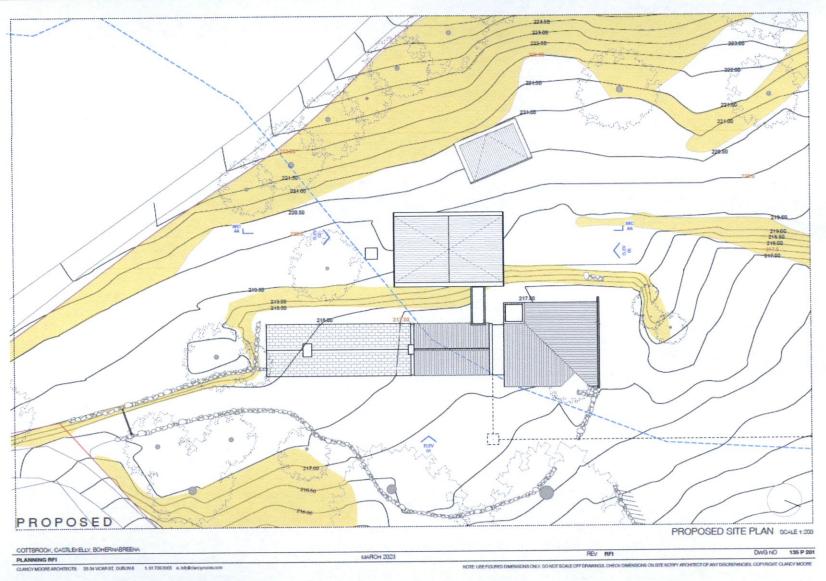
PROPOSED SITE LAYOUT (CLANCY MOORE ARCHITECTS, 2023 DRG. NO. 135 P 201).
